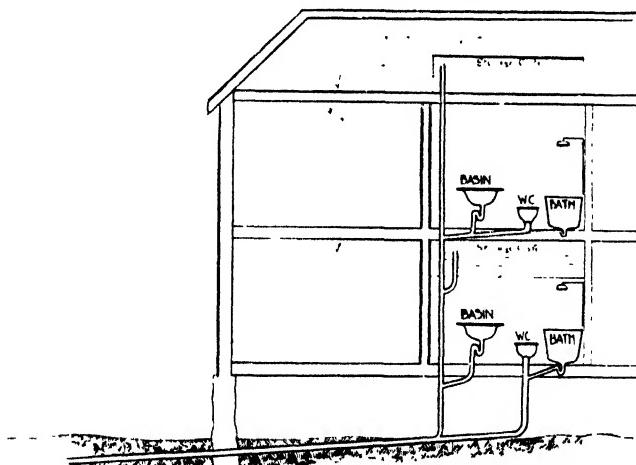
Examples of faulty construction showing how overflow pipes conveyed sewer gas into a house.
